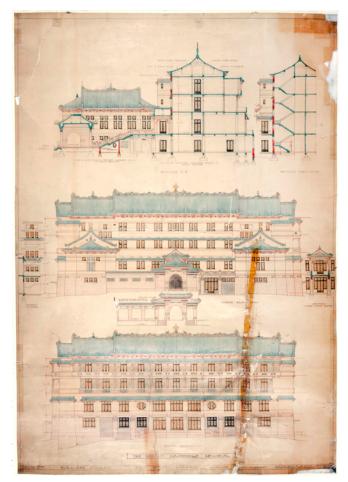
Plans for Gerald MacDonald Memorial in Stanley drawn by Little, Adams and Wood in November, 1932. Plans show North Elevation and South Elevation, Front Entrance Gate and Sections. (Source: Maryknoll Mission Archives New York).
